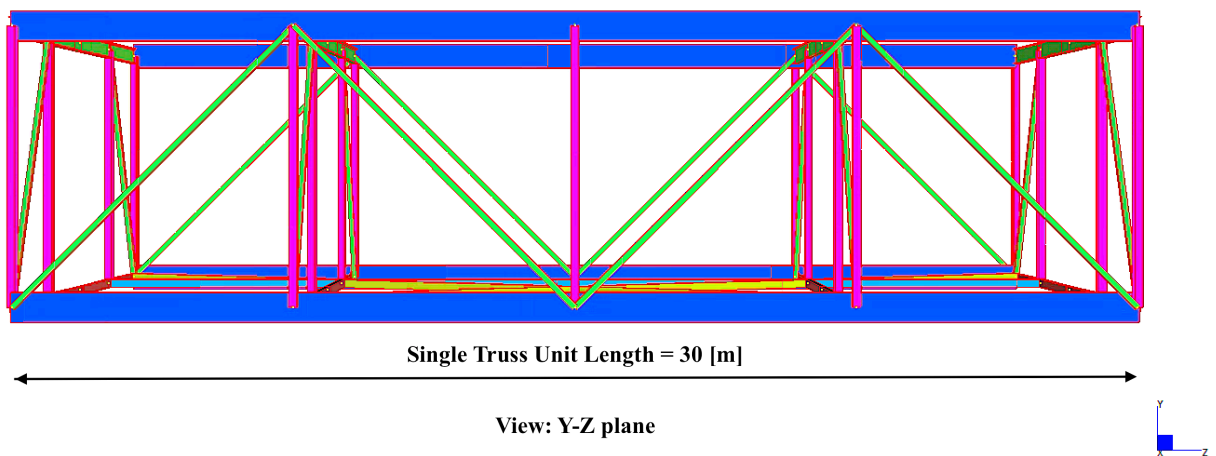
Single unit of the truss girder, Y-Z plane view.
